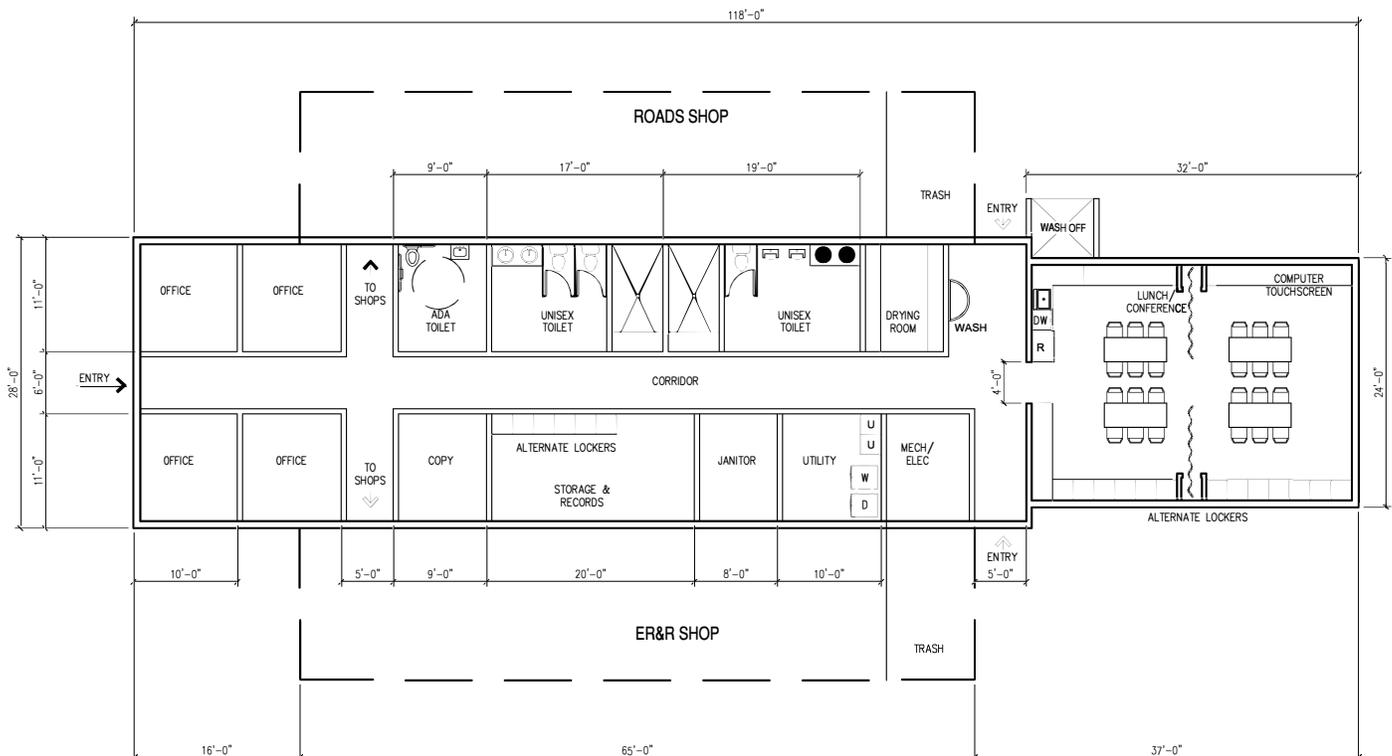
CREW SUPPORT BUILDING DETAIL
